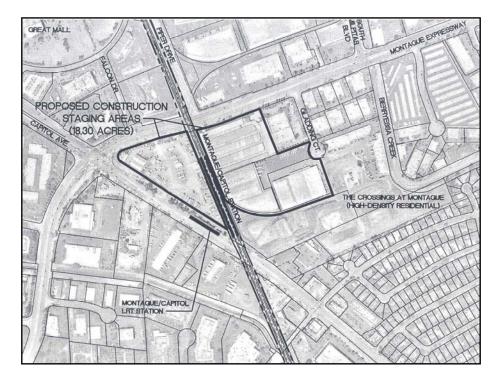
Construction Staging Site on Either Side of Rail Corridor South of Montague Expressway
